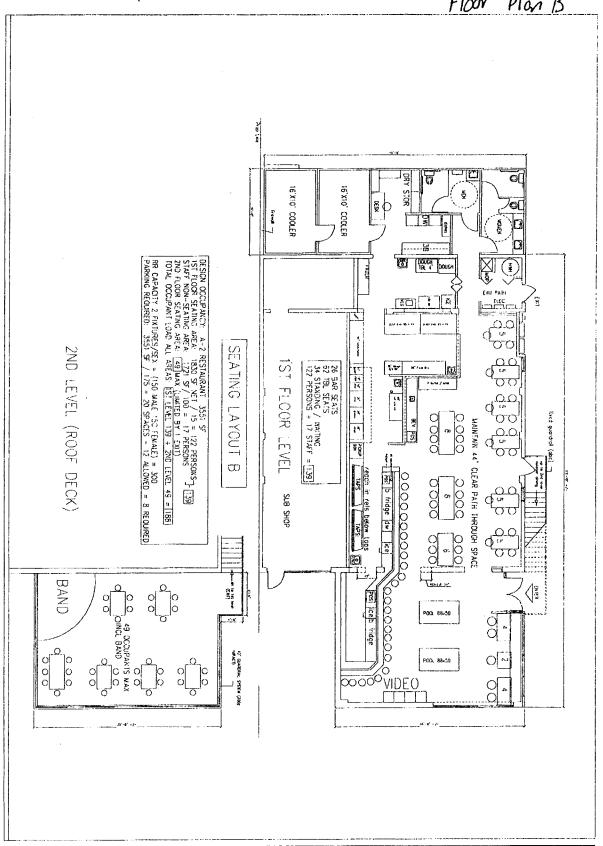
Exhibit A - Floor Plan(s) Worksheet - Floor Plan B Entertainment Establishment
